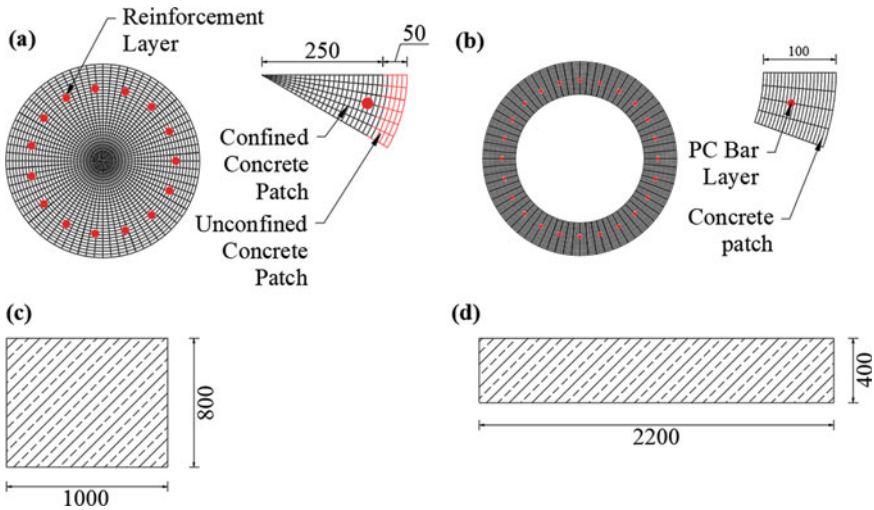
a RC bored pile fiber section, b PHC pile fiber section, c pile-head elastic section and, d beam elastic section representing the concrete slab
